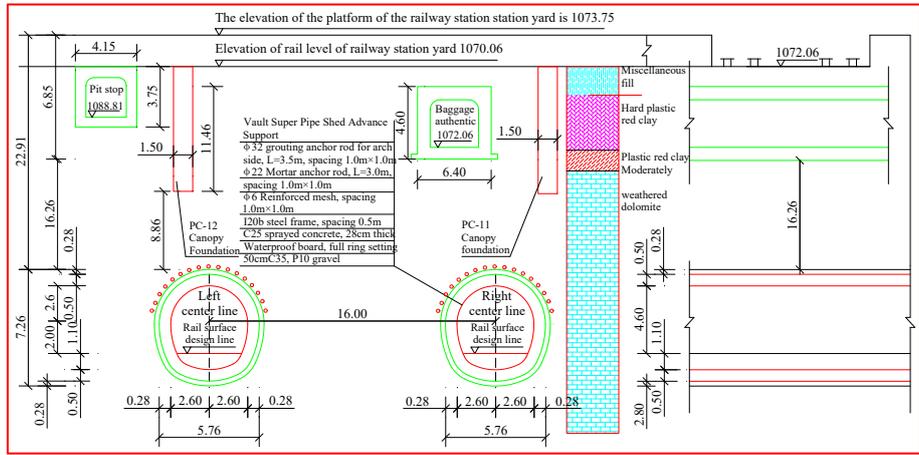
Design drawing of the longitudinal section of the Huo-Sha Tunnel (size unit: m)
